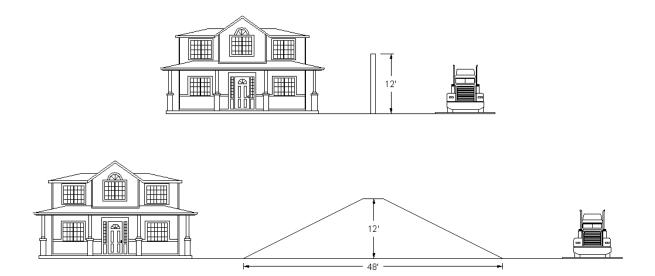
Base Width Requirements of a Traditional Concrete Barrier and an Earth Berm
